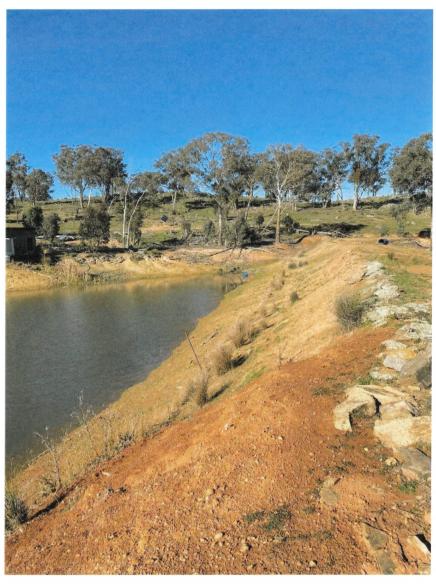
Downslope of dam embankment. Facing west. Sedge grass evident in foreground, likely through seepage underneath dam embankment.
